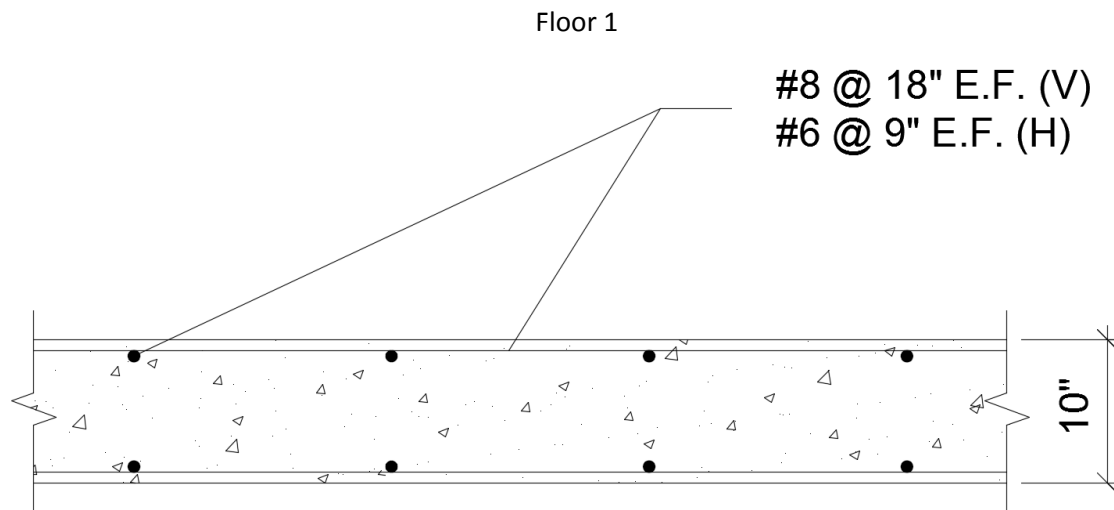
Segment of exterior wall cross-section at the 1st floor level based on SDC D design.
